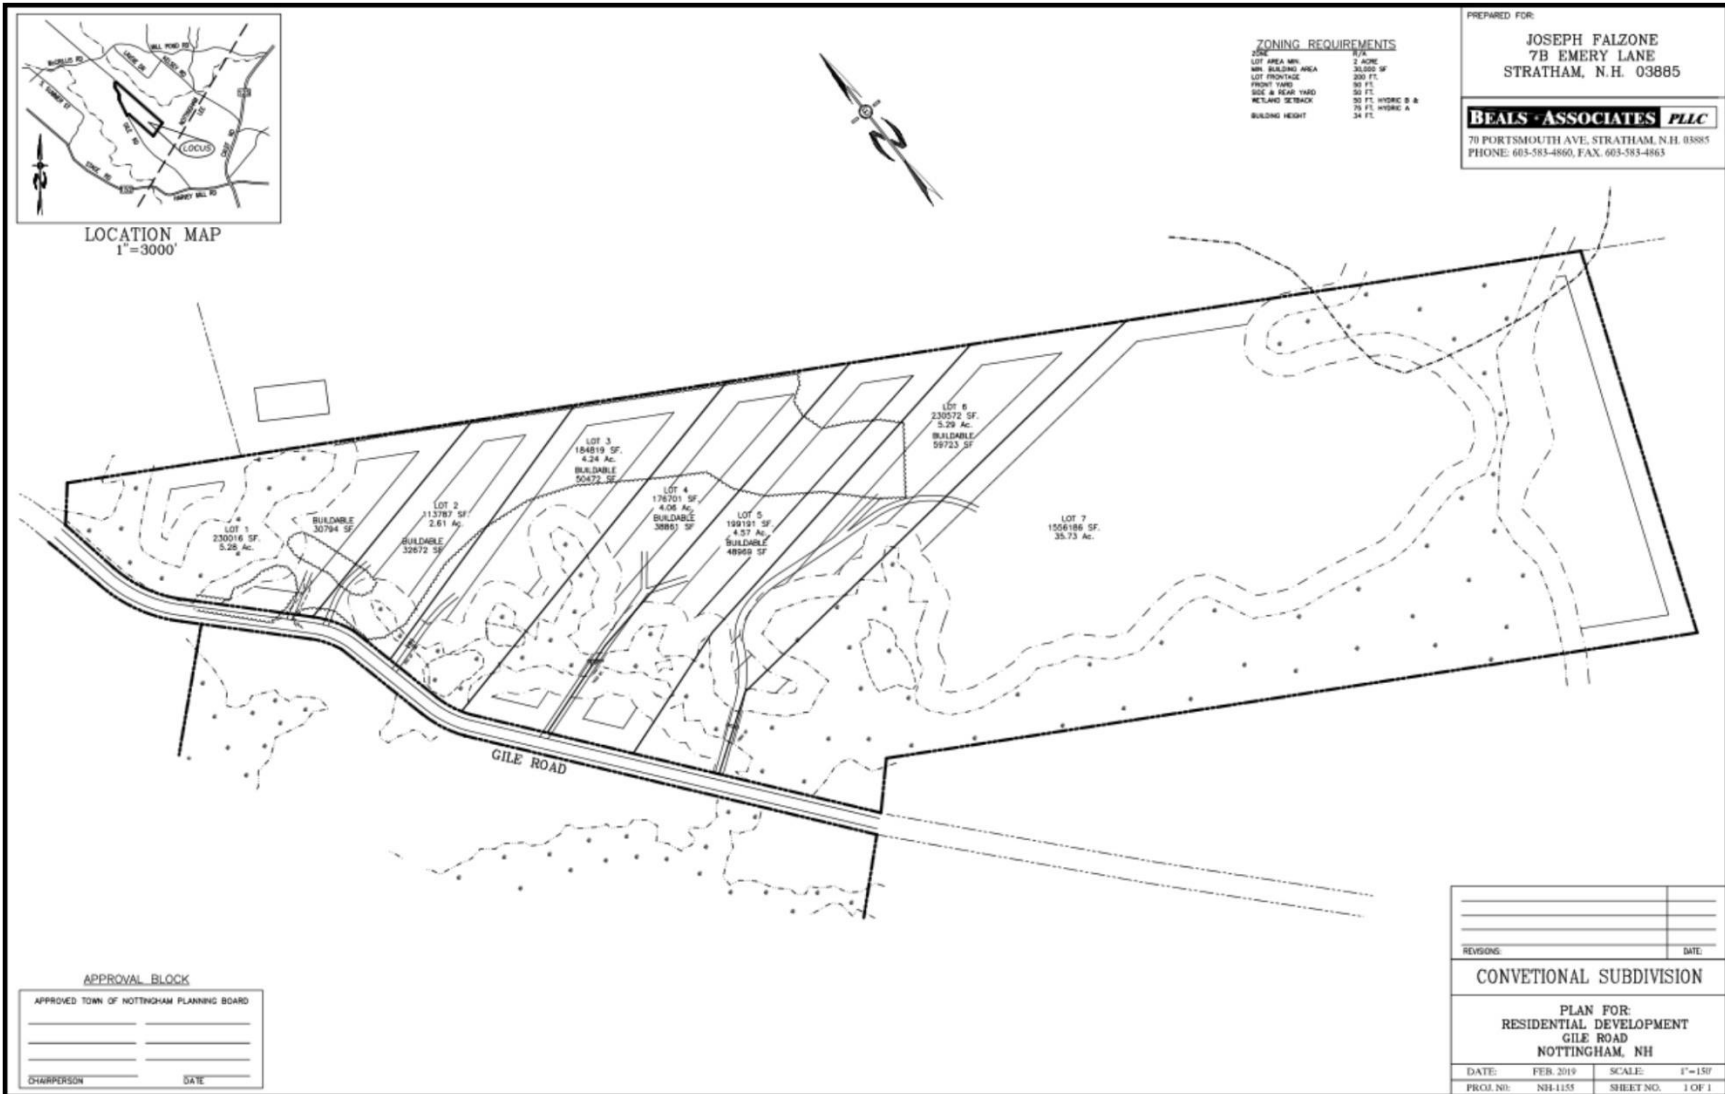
Subdivision Plan for the Gile Road Residential Development Project.
